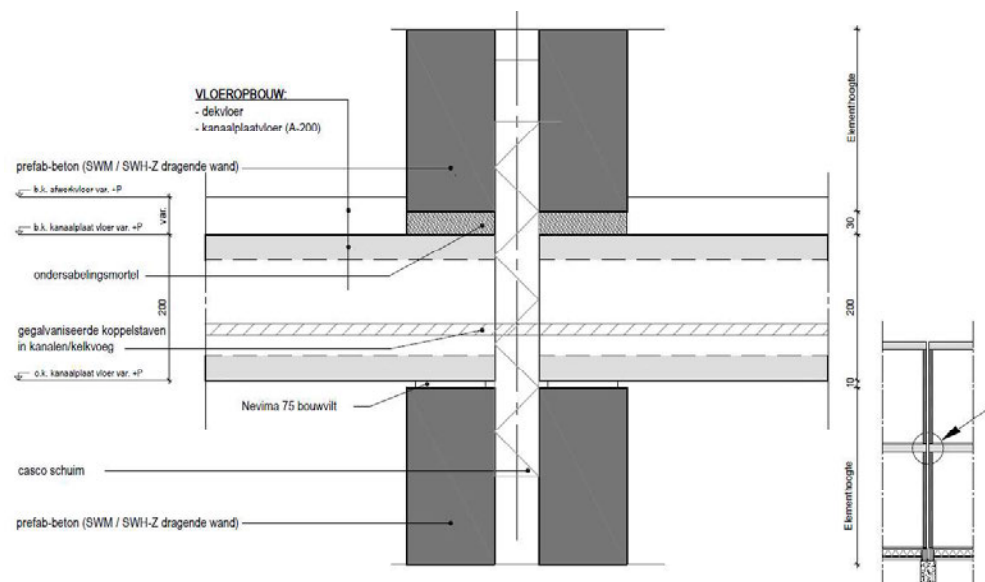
Wall-floor connections; adapted from [Arup, 2017].
